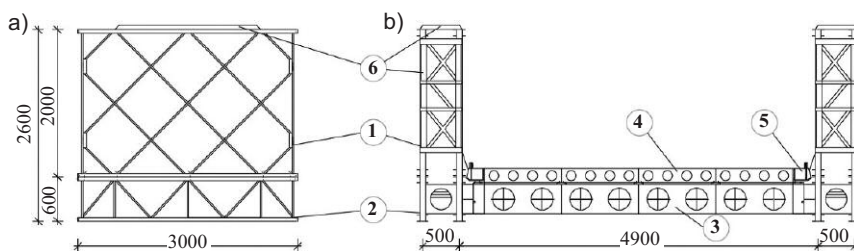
DMS-65 bridge segment in the basic configuration without sidewalks: a) side view; b) cross-section: 1 – panel; 2 – spatial truss; 3 – transom; 4 – road plate; 5 – ribband; 6 – bracing frame
